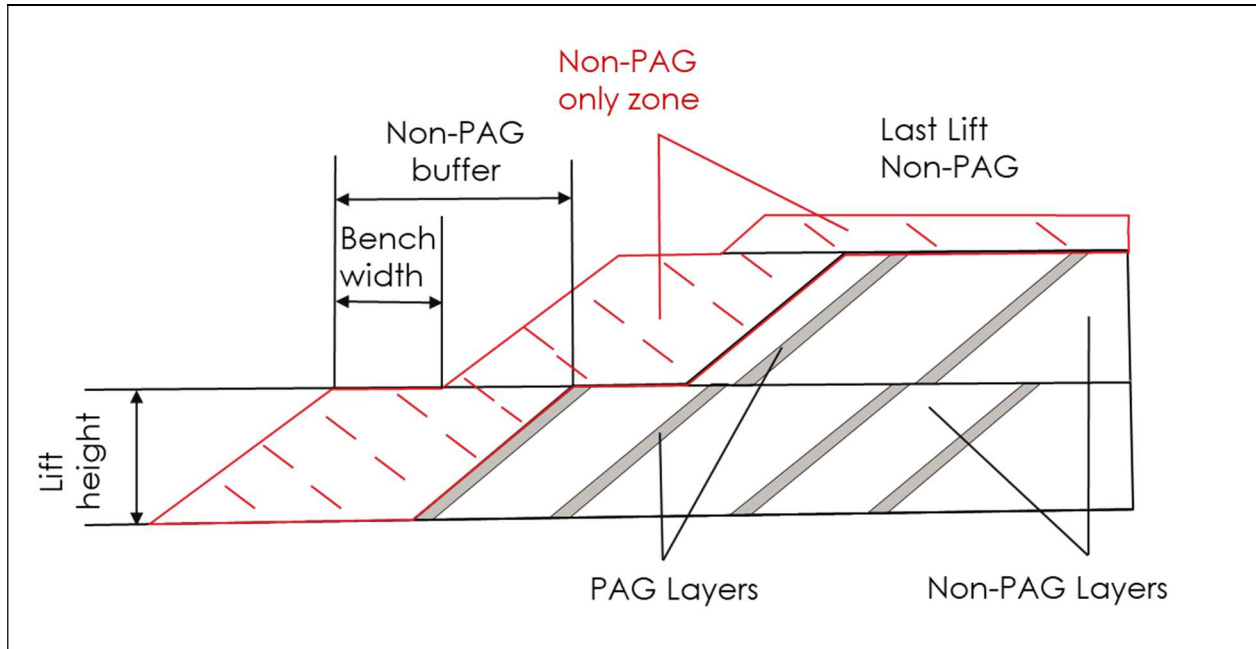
Conceptual Cross-Section of Mine Rock Pile
